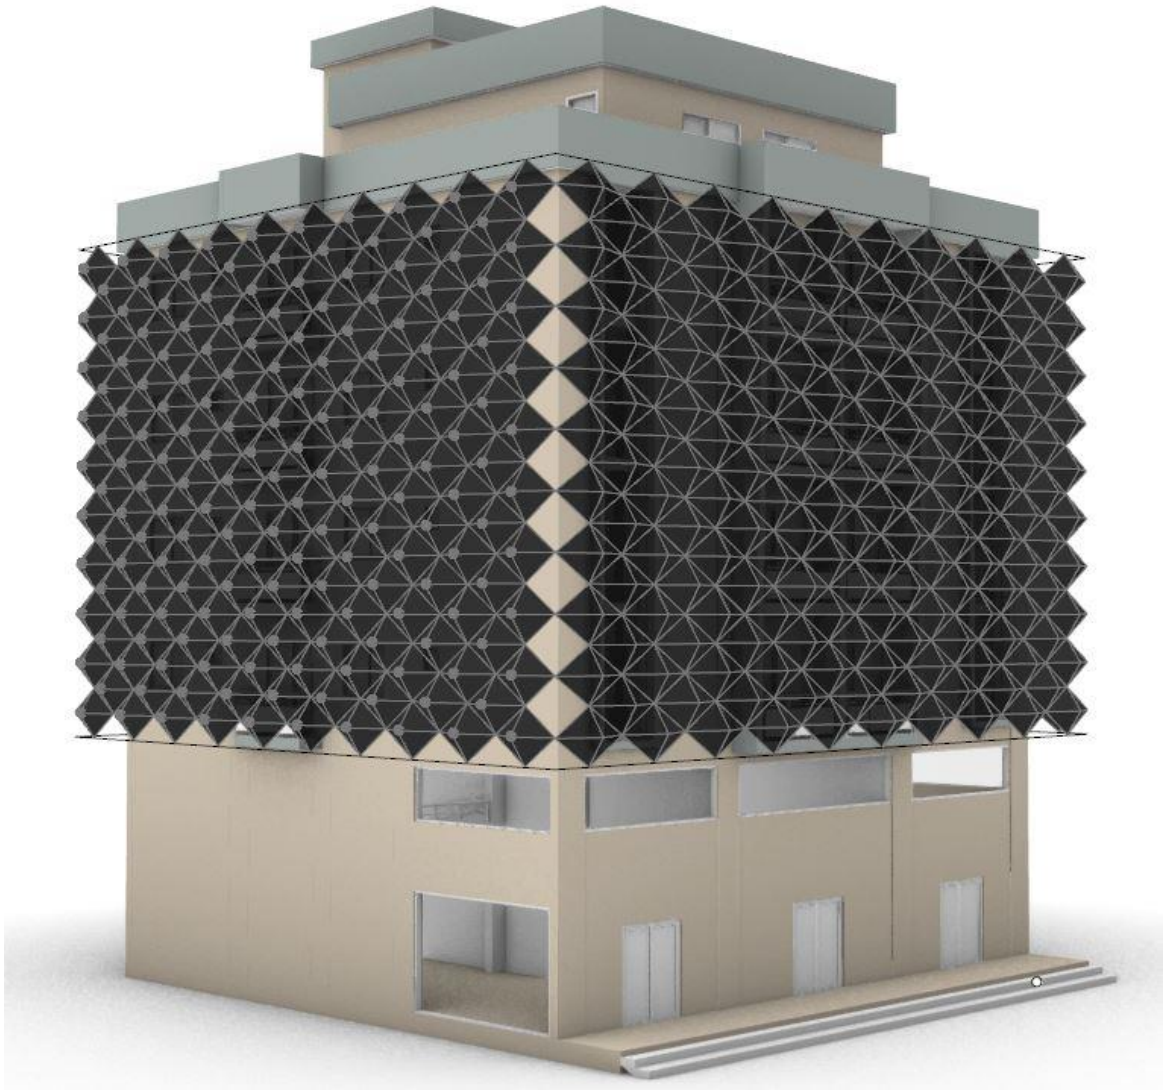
3D visualization of the Diamond form façade elements surrounding the building fully contracted (Author, 2023)
